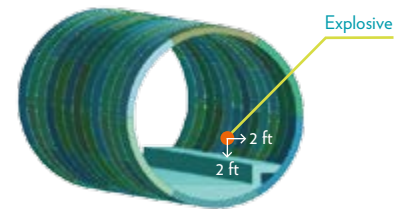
CROSS SECTION OF TRANSIT TUNNEL IN 3D MODEL
